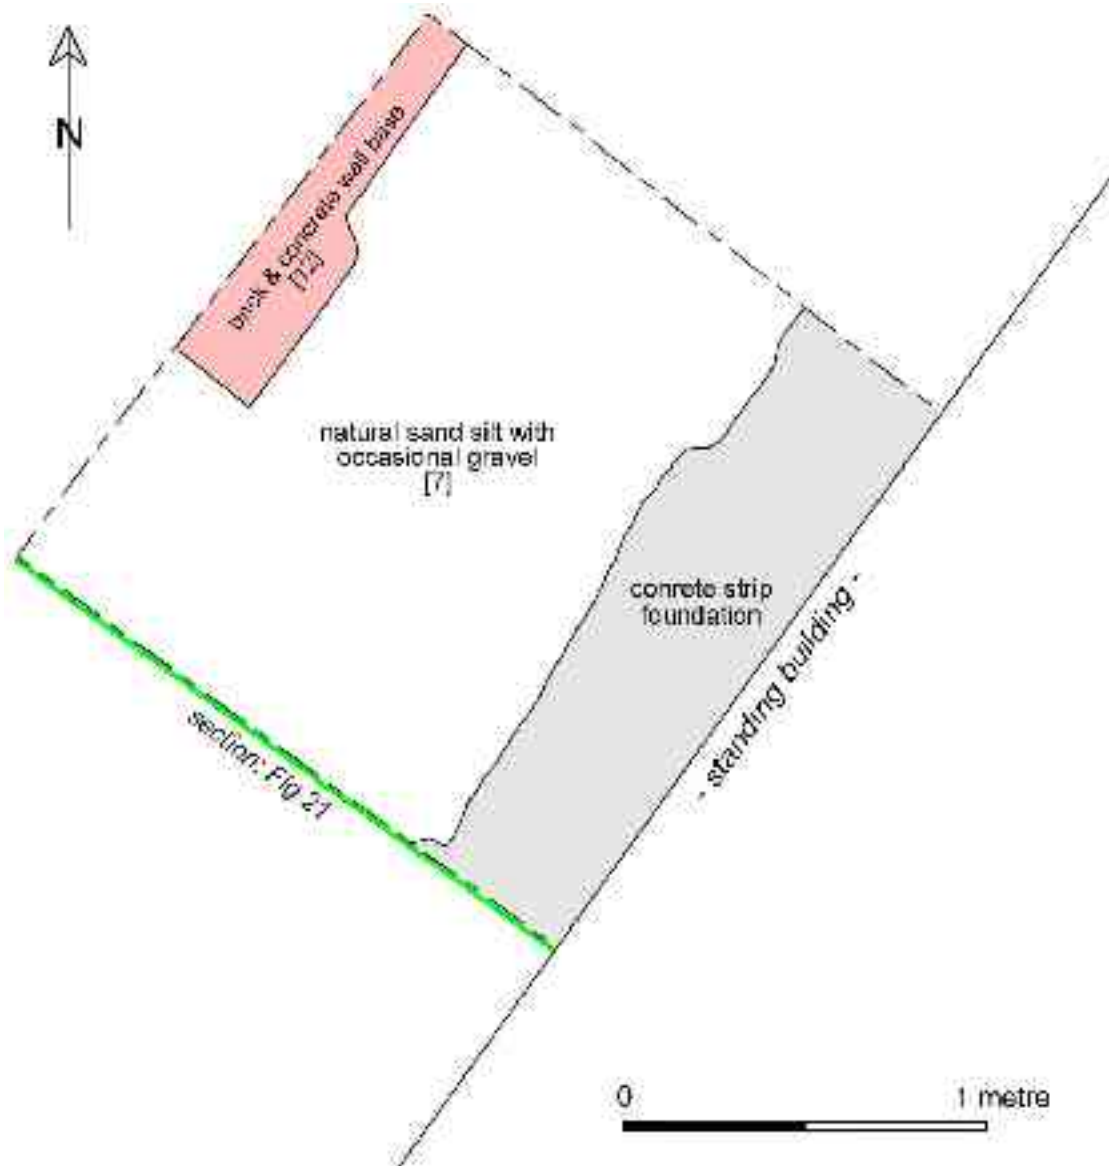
Plan of Test Pit 2. The wall footing [12] formed part of the rear wall of the former semi-detached house as shown on Figure 15 above
